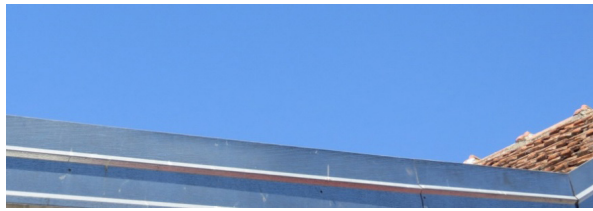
Roof with metal rakes. Wider metal rakes will prevent direct wind impact on the roof edges, preventing the lifting of the first row of roof tiles or other roof materials.
